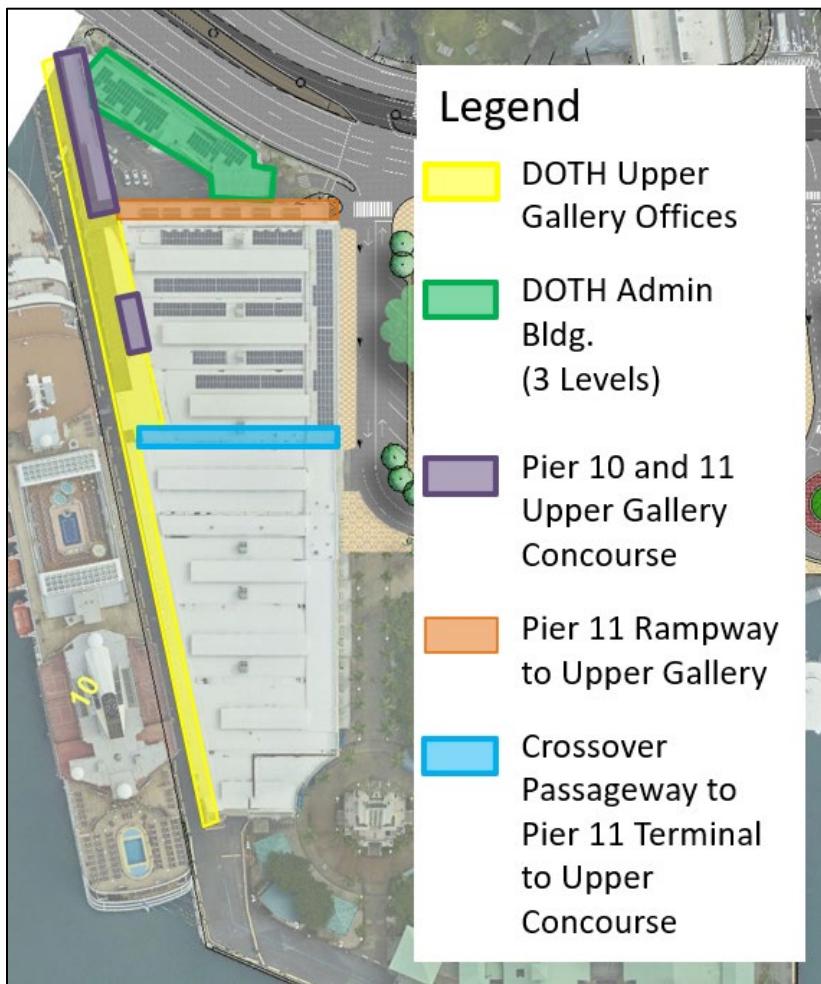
Piers 10 and 11 Existing Conditions – Upper Gallery Level
